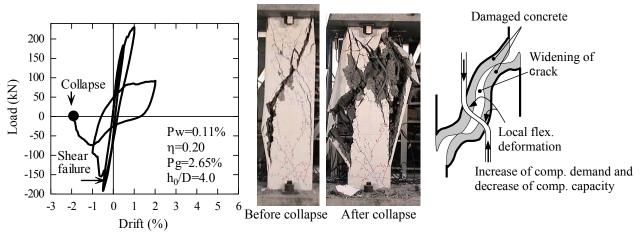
Collapse of S-mode specimen (Specimen No.3)
